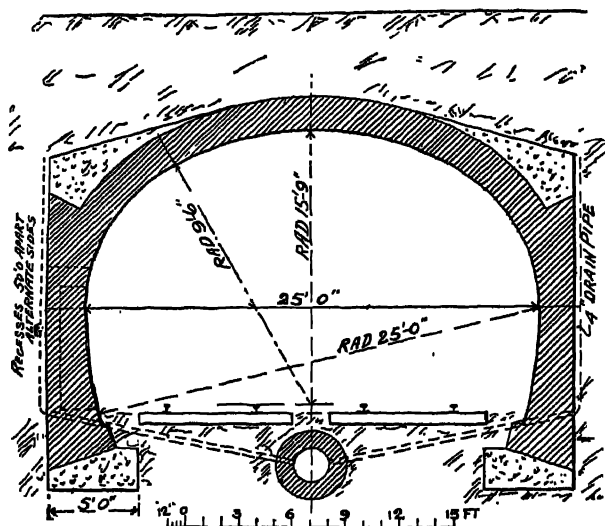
Type-section of arched covered way, Metropolitan District Railway, London.
